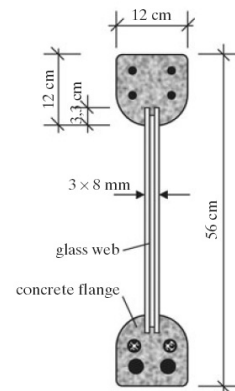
Glass-Reinforced Concrete beam (section), proposed by Freytag.
